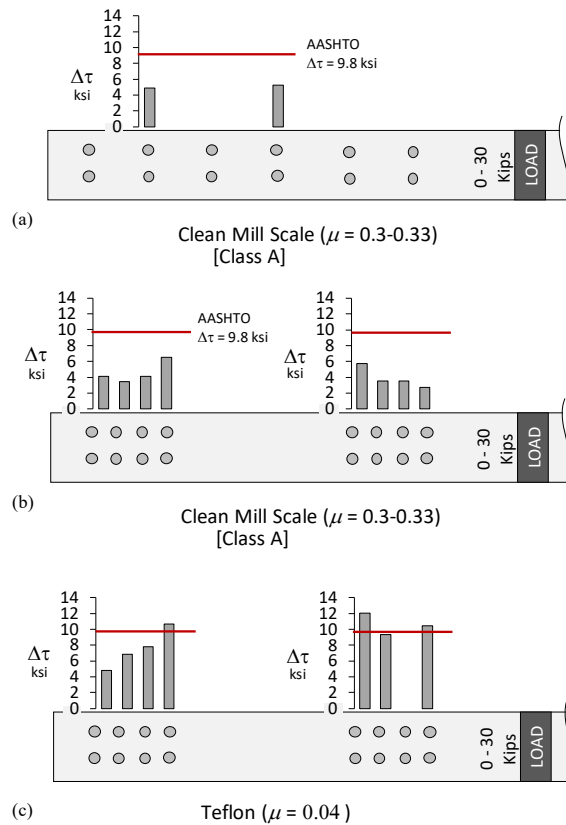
Calculated peak stud shear demands from maximum recorded pressure gauge measurements, a) Specimen 1 with clean mill scale flange surface, b) Specimen 3 with clean mill scale flange surface, and c) Specimen 4 having PTFE sheeting between the flange and concrete slab.
